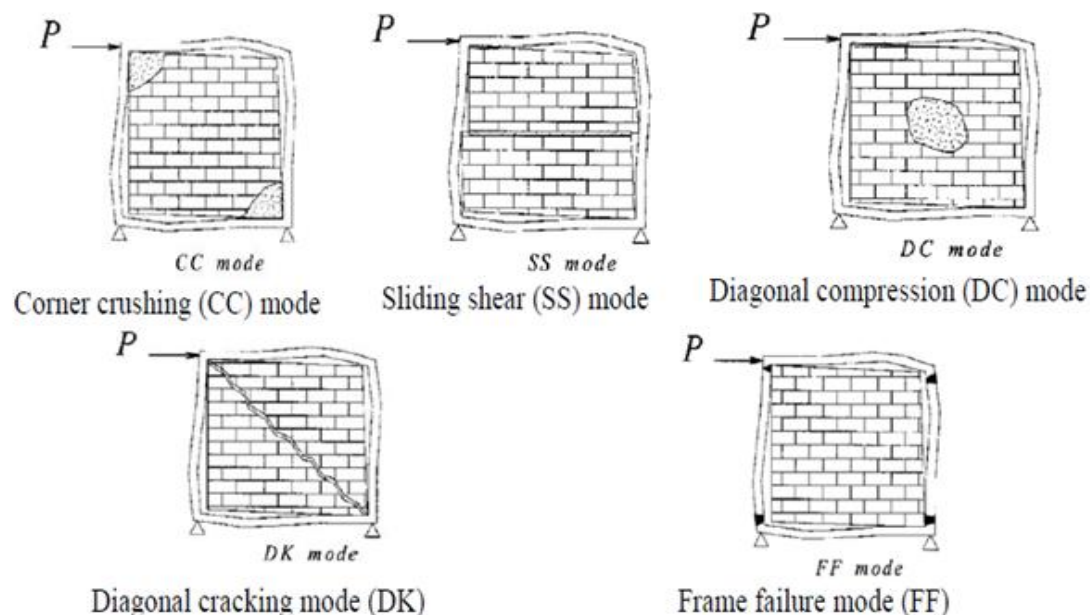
Various Modes of Failure of RC Frame With Infill Masonry Wall (Dakhakhni 2003).
